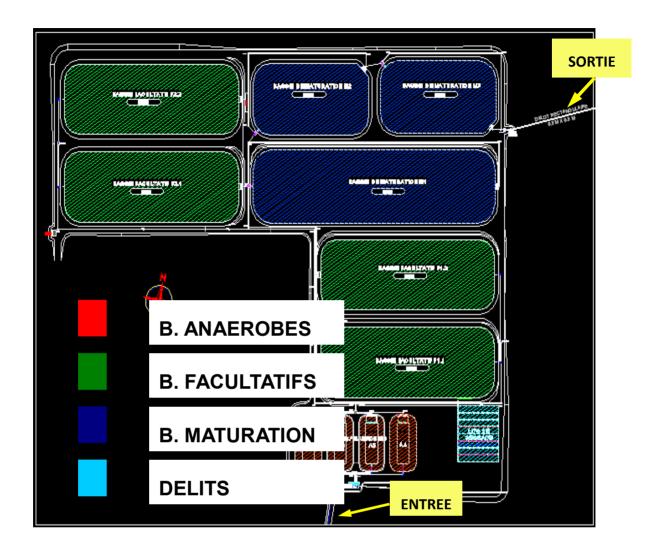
PLANT DESIGN LAYOUT (NGHIRA 2009)
